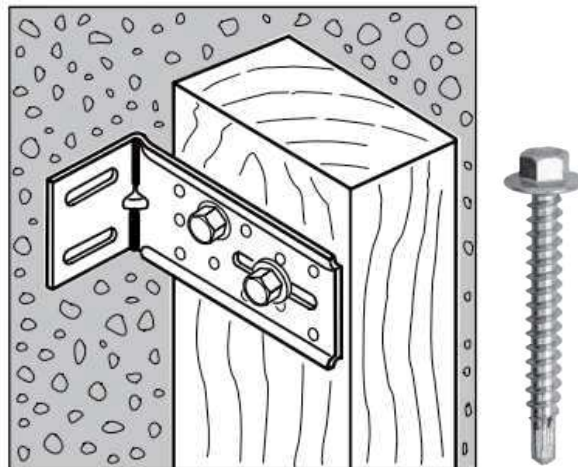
Fixing the wooden uprights to the supporting squares (2 $\varnothing \geq 6$ screws)
